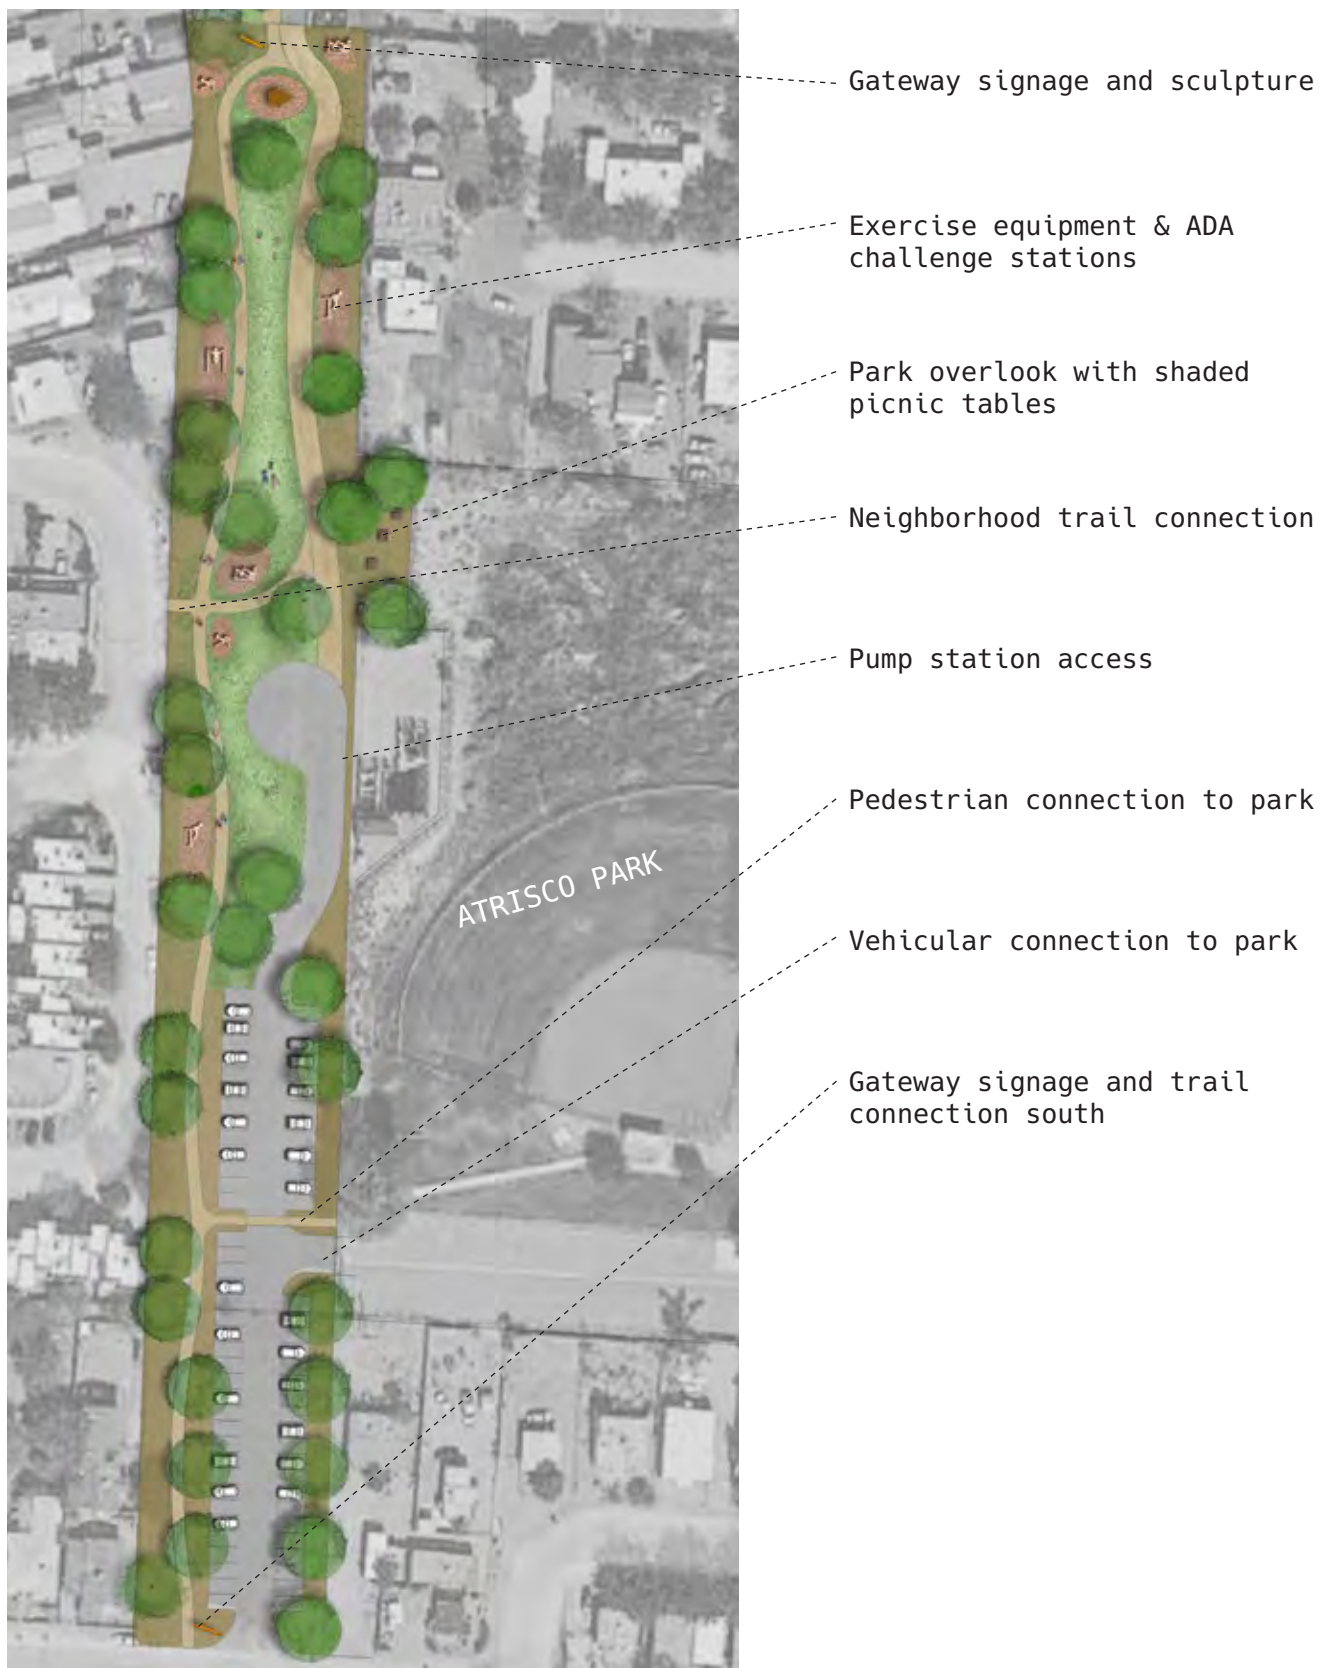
NORTH GATEWAY TRAILHEAD - ATRISCO PARK
